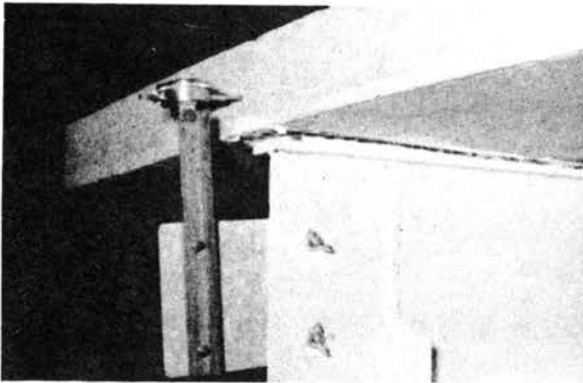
Beam 14b at failure. Note the large slip between the steel flange and the concrete slab. Also the separation between steel and concrete can be clearly seen.
